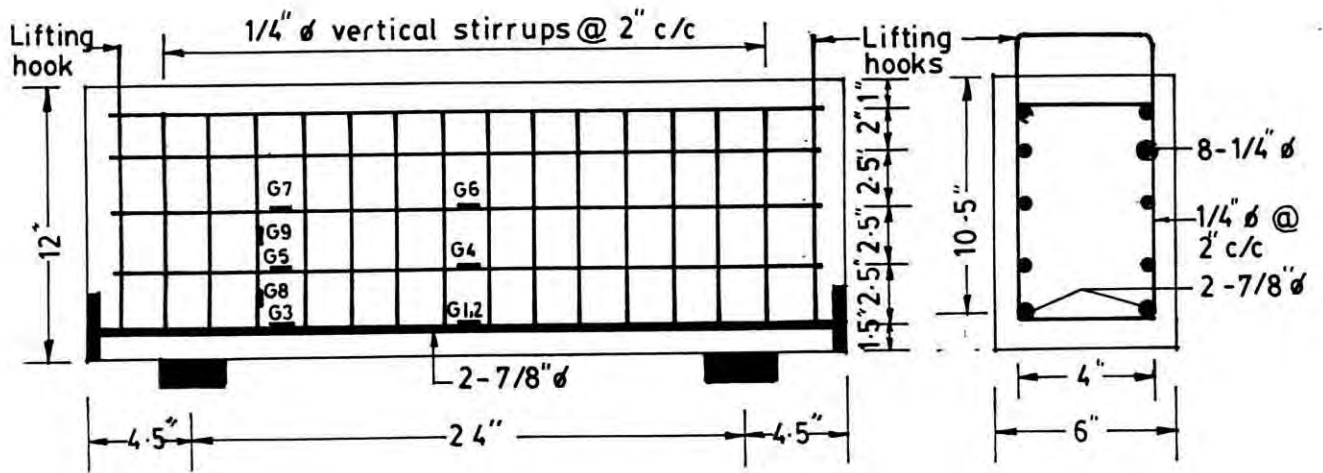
Reinforcement arrangement of beam DB - Q2
